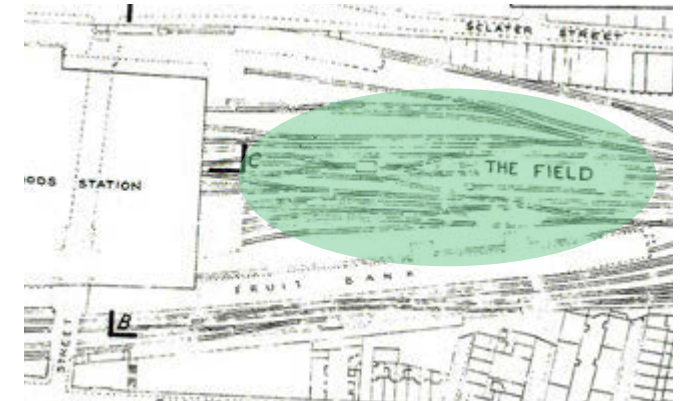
Plan: 1964 Platform level plan drawing
